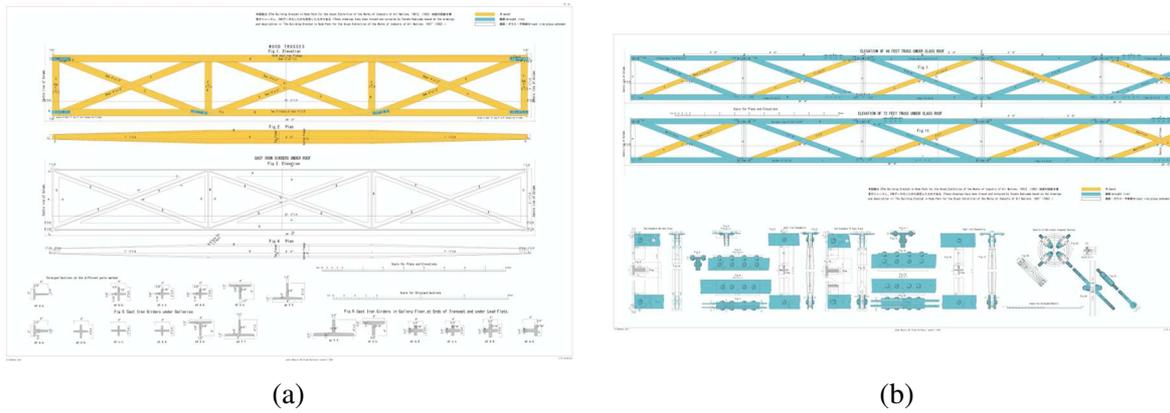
Drawing of truss beams (traced and colored by third author): (a) Wooden truss and cast-iron girder in PL.10, (b) 48-foot and 72-foot truss in PL.11.
